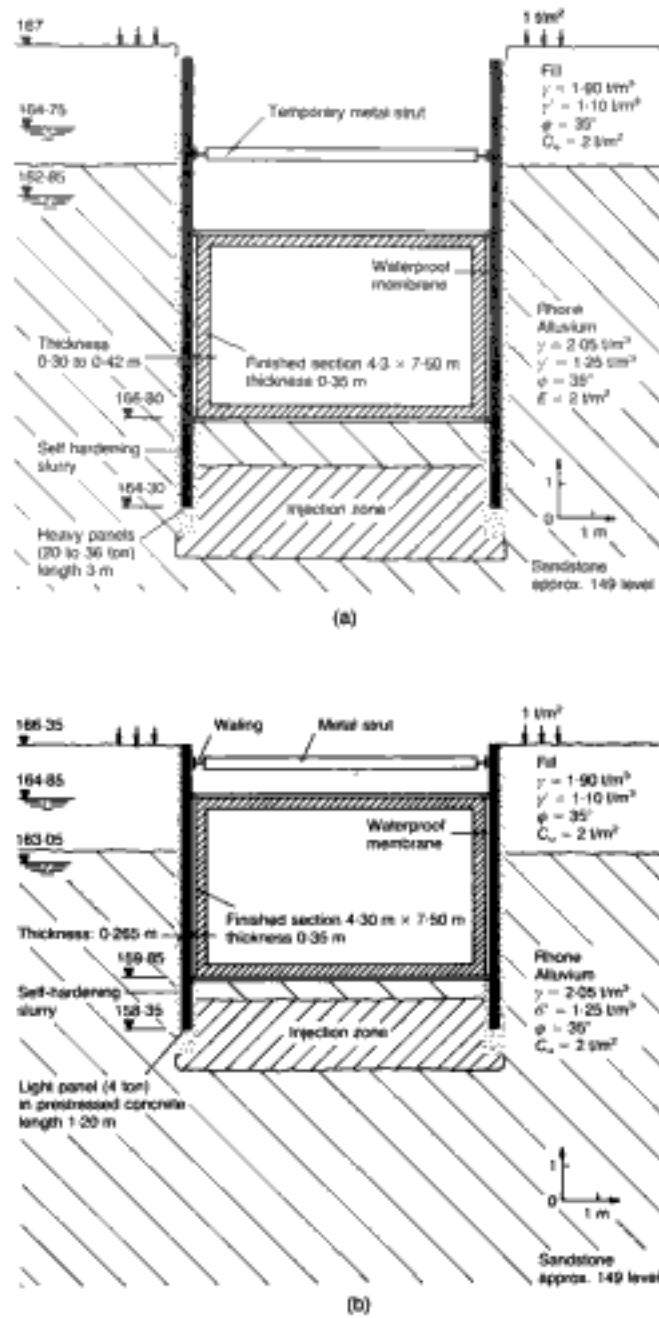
Lyons Metro, typical sections of running tunnel: (a) deep section constructed with precast reinforced concrete units; (b) shallow section using precast prestressed concrete units (courtesy of Soletanche)
